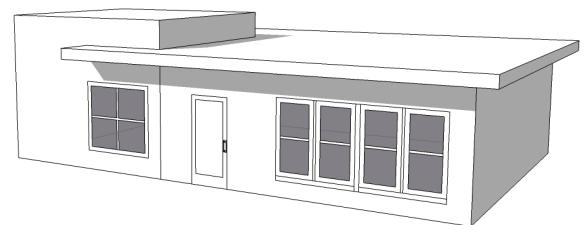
Flat roof example with interrupting vertical wall on left side
